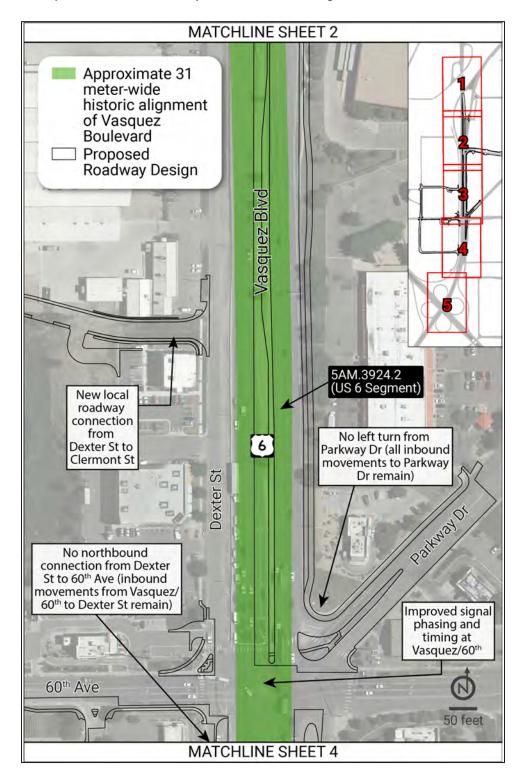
Vasquez Boulevard Proposed and Existing, Sheet 4
